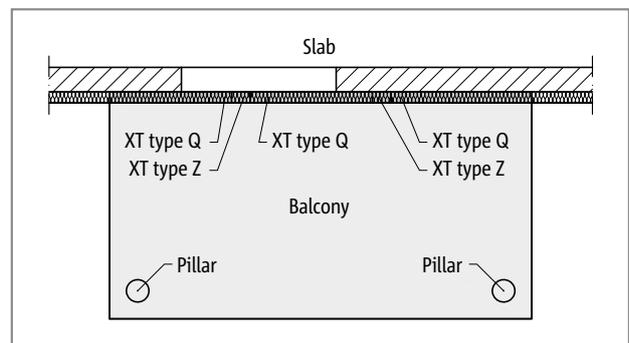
Schöck Isokorb® XT type Z, Q: Balcony with column support
